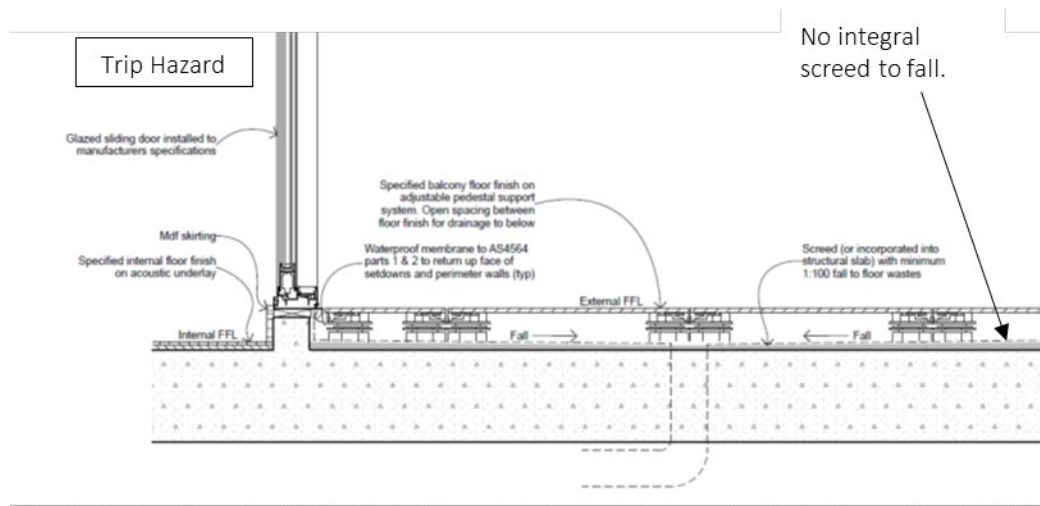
Balcony construction (CI's interpretation of the balcony construction details)
